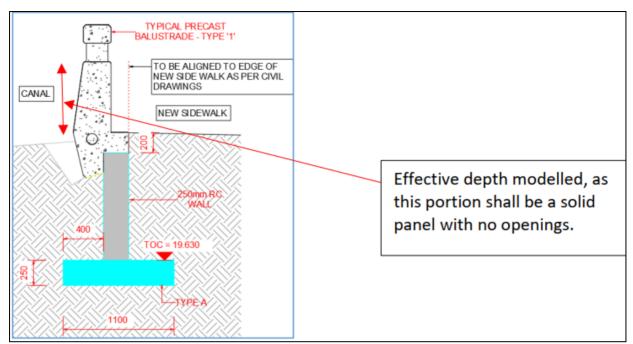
Proposed concrete balustrade and stormwater modelling applied (source: GIBB, 2021)
